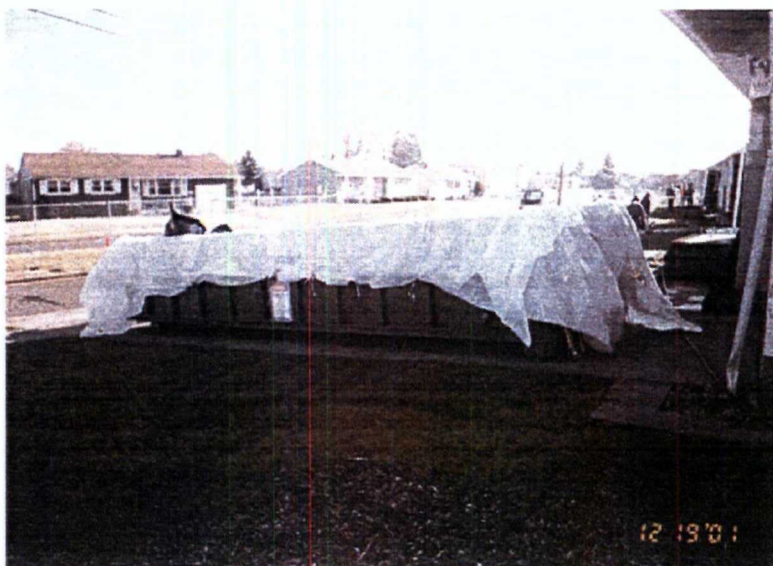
Basement Backfilled – 98 Valerie Drive
